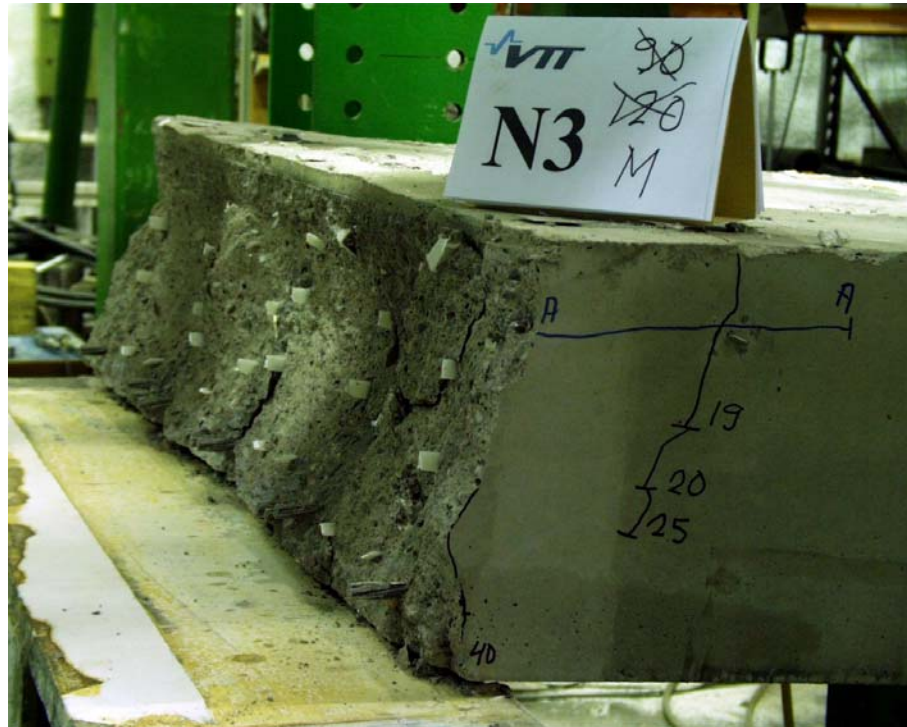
N3, South edge. Failure crack and flexural cracks.
